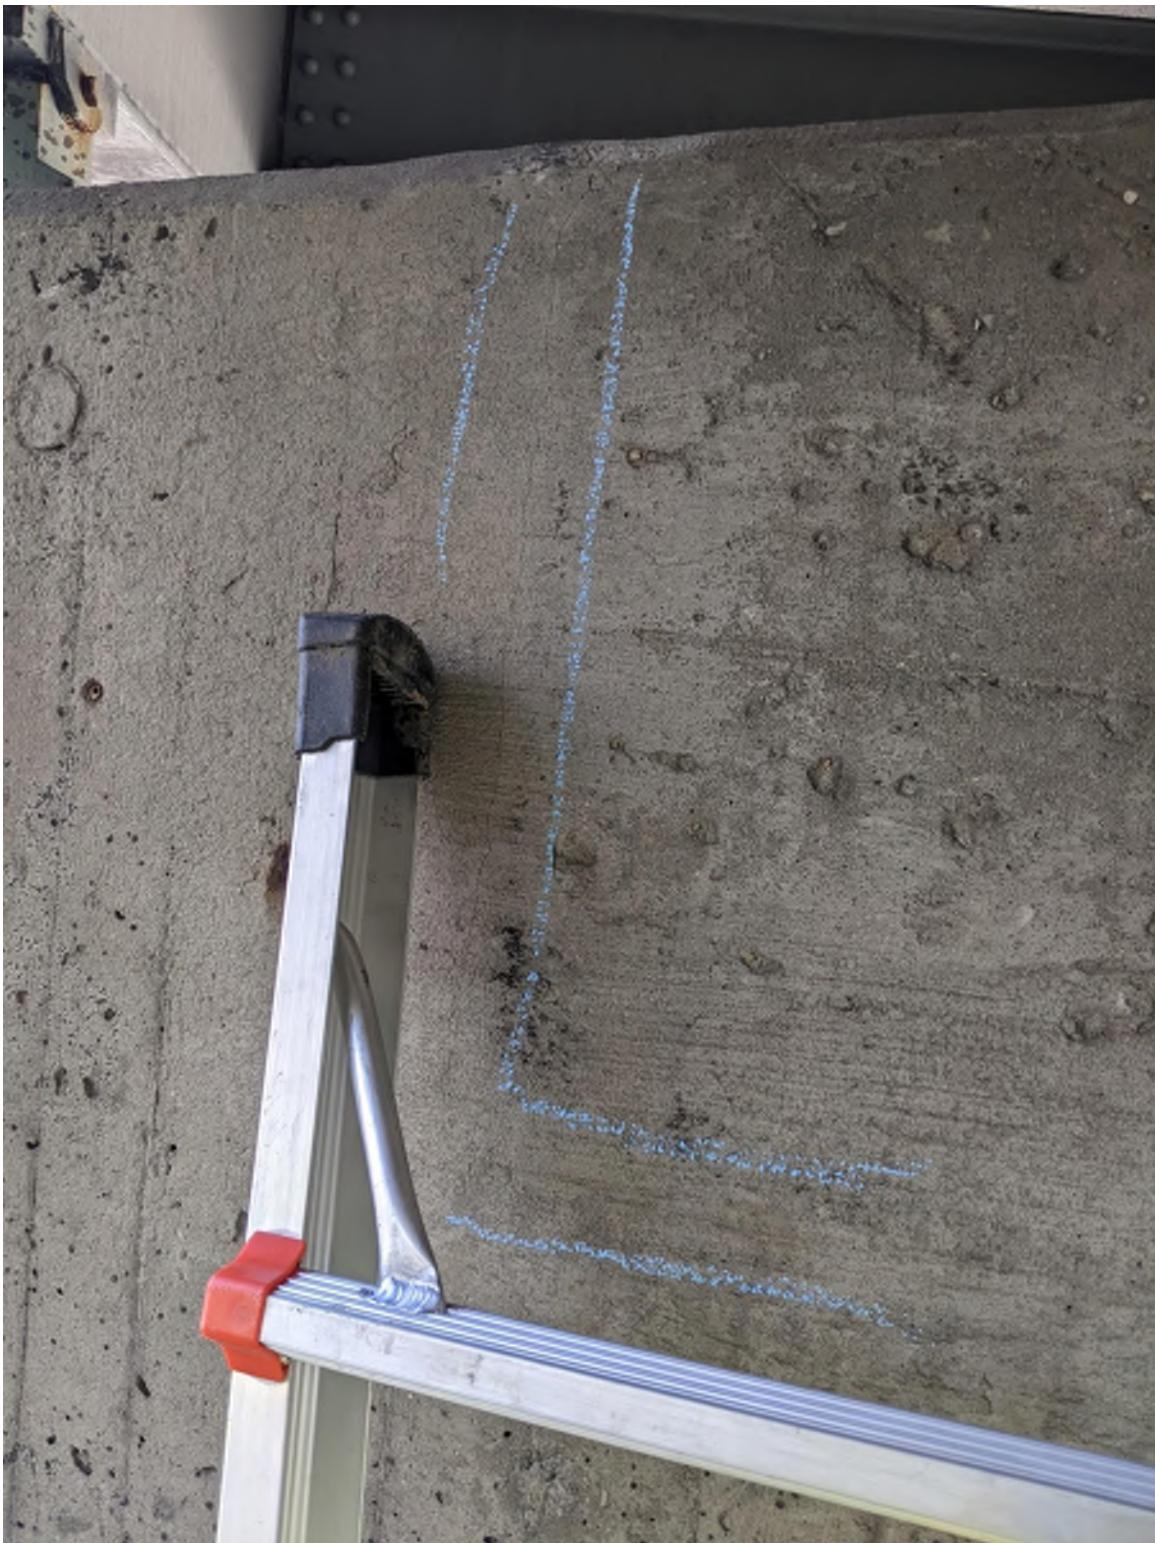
Location of Proposed Concrete Repairs - Pier 3 Underside of Pier Cap MP 182.1
